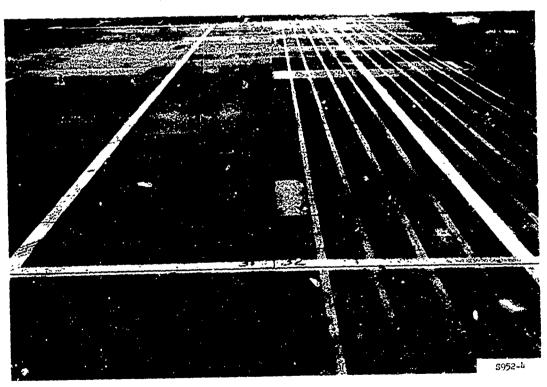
Top skin tears and end-joint failure after 314 coverages
